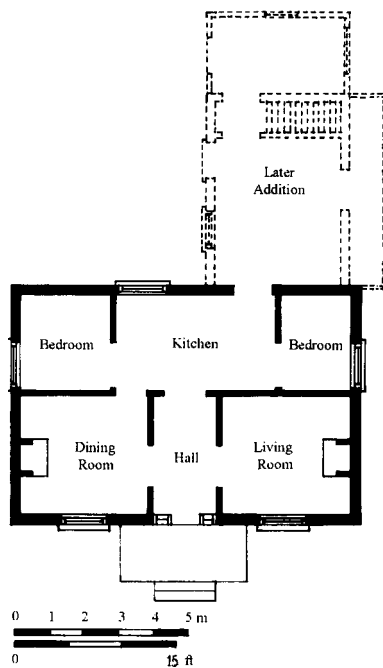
Typical cottage floor plan. Windrush Cottage, St. Marys, Ontario. (Drawing by Lee Ho Yin.)
